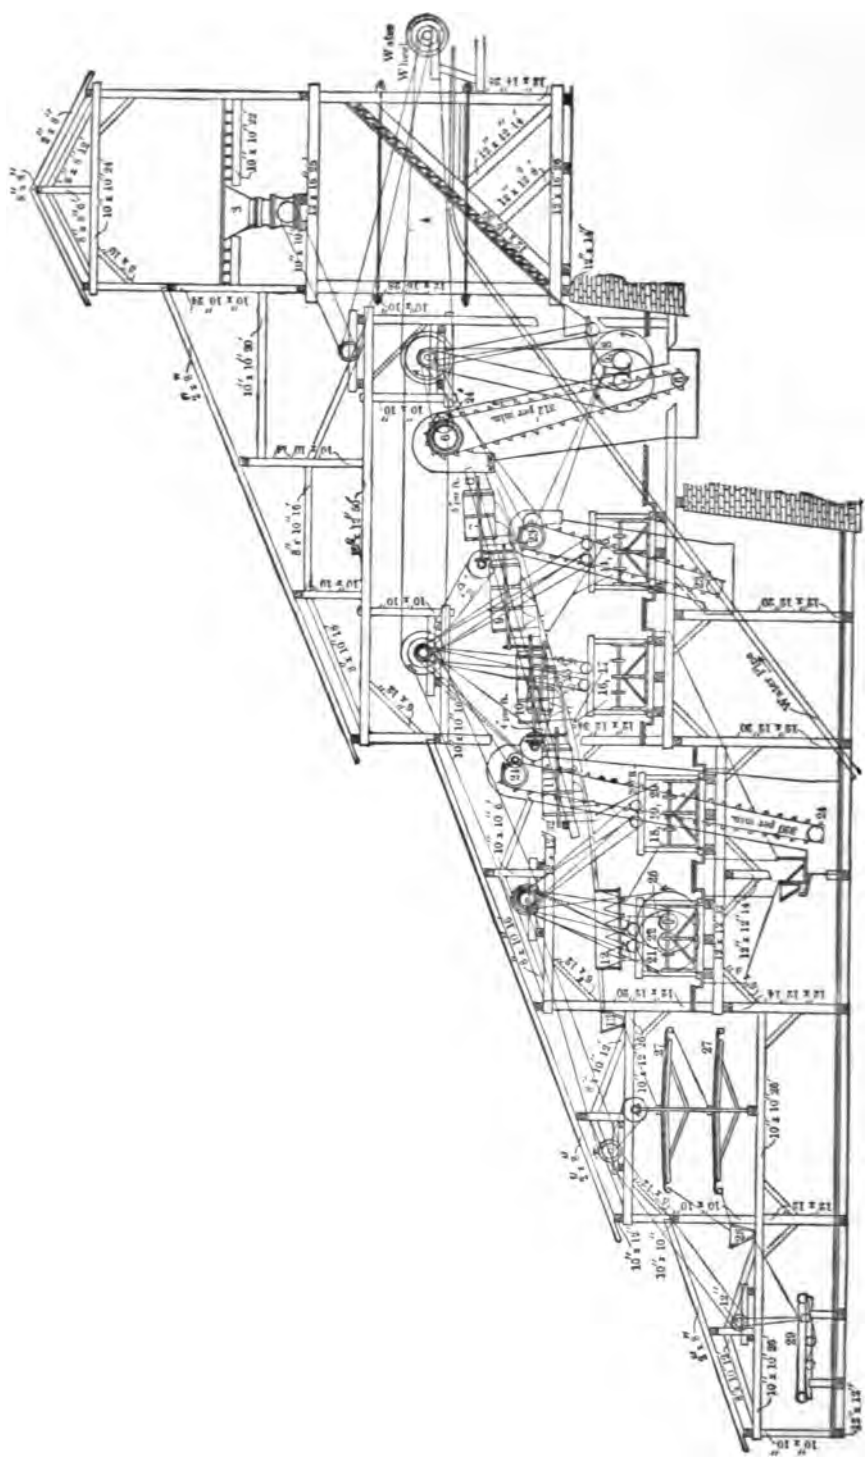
ELEVATION OF HILL-SIDE TYPE.
